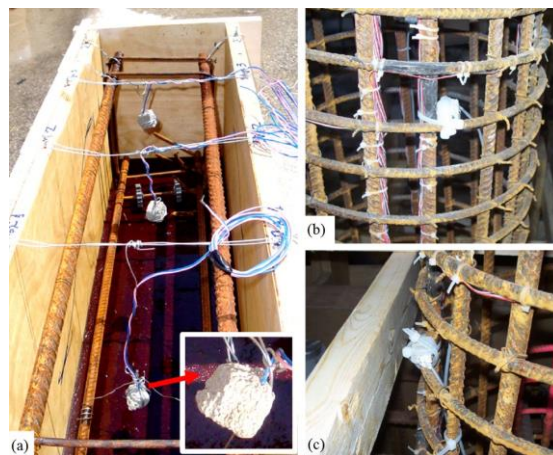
Fixing PZT SA inside structural elements: a) installation of PZT SA inside the wooden formwork of RC beam [2], b-c) A PZT SA fixed on the rebar cage of column [3]
